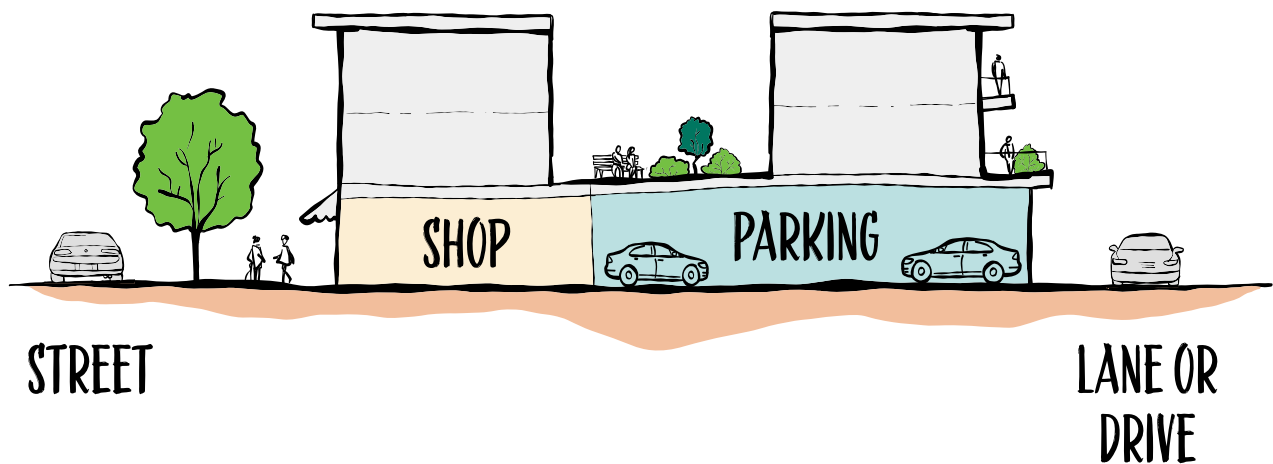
Wrap parking structures with active frontages to avoid blank walls facing the street.
